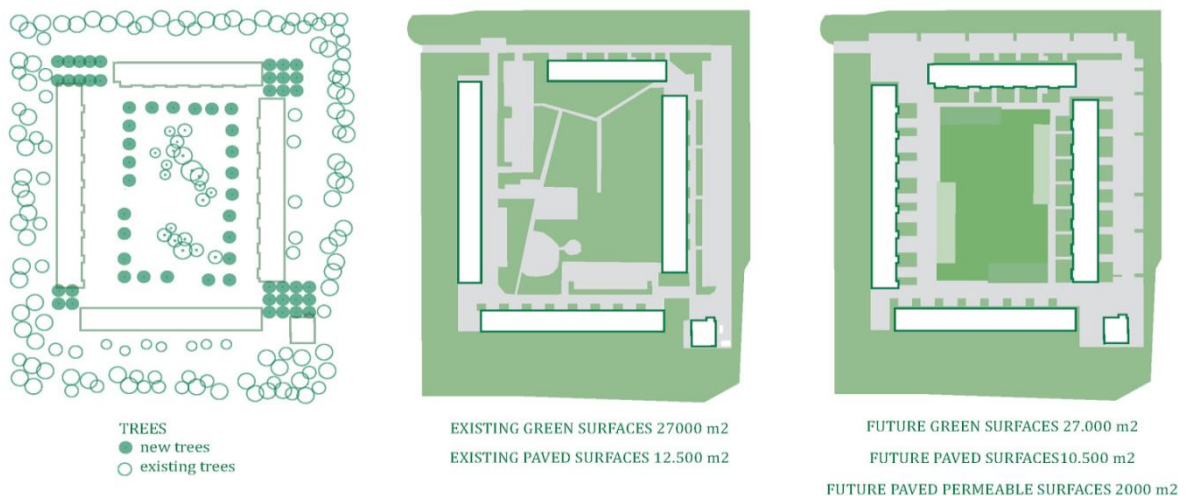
Existing & future landscape (Khan Architects et al., 2013)
